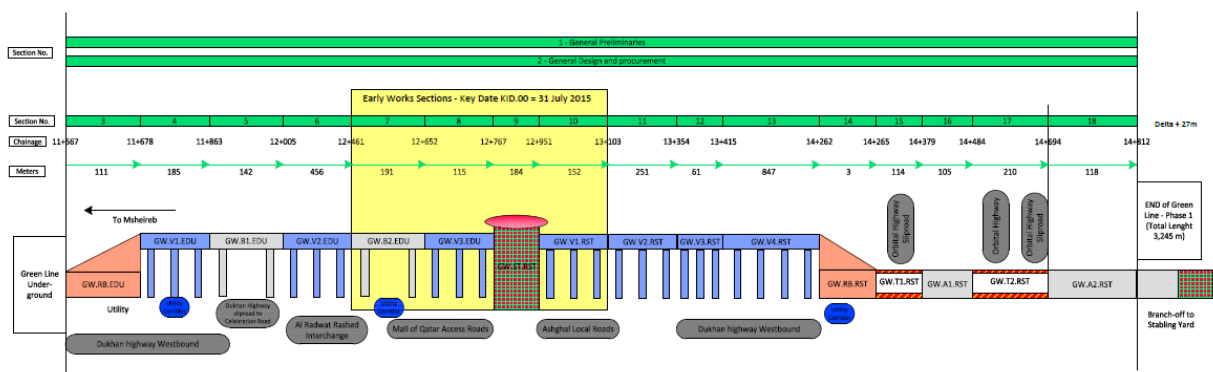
Schematic overview of Green Line Doha Metro elevated section
